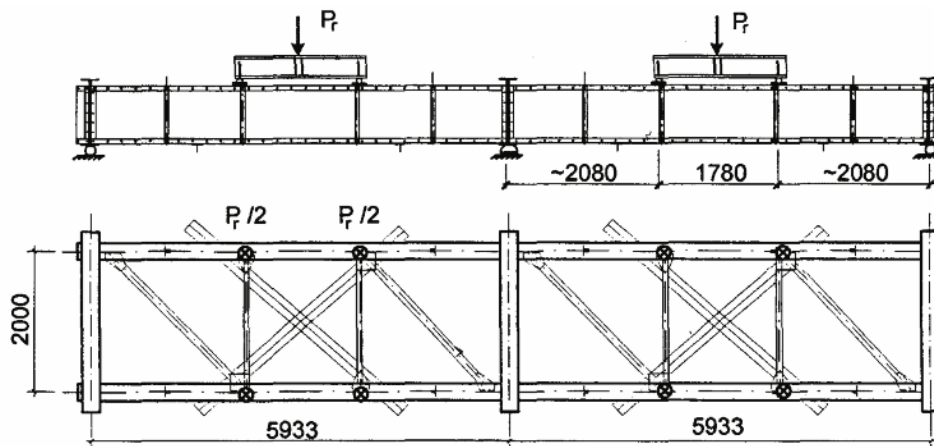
Stringer-to-cross-girder assembly tested by Al-Emrani [45] (dimensions in mm).
